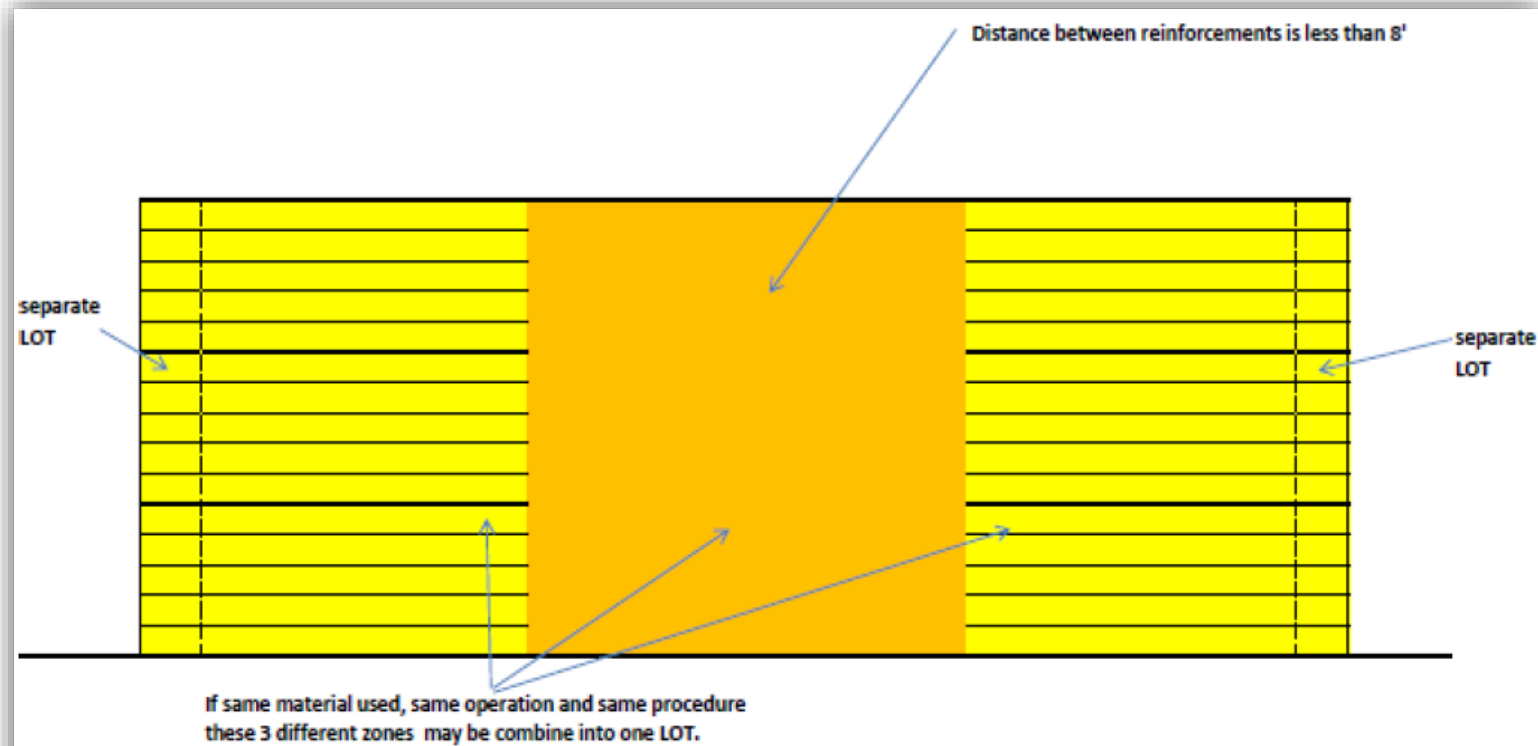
Paralell walls, with a narrow gap between reinforcements
